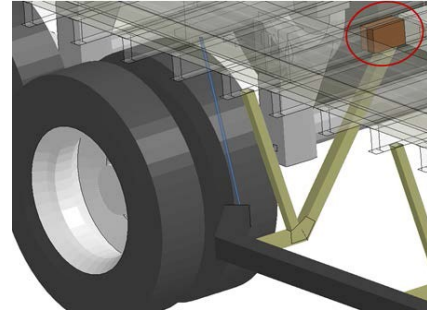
SUSD brace connection stiffening (zoomed image).
